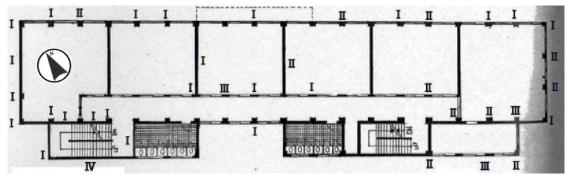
Building No.70 damage degree determination result (Level 1 and Level 2)
